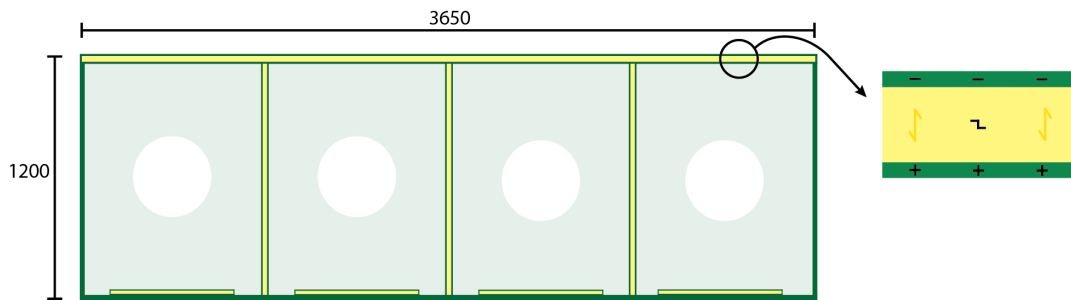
Cross-section of pedestrian bridge Ritsumasy1 [mm]
